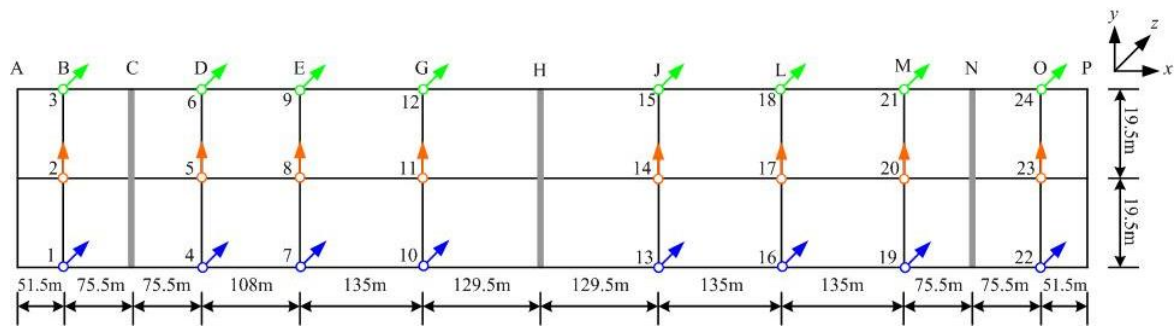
Detailed arrangement of accelerometers on bridge deck
